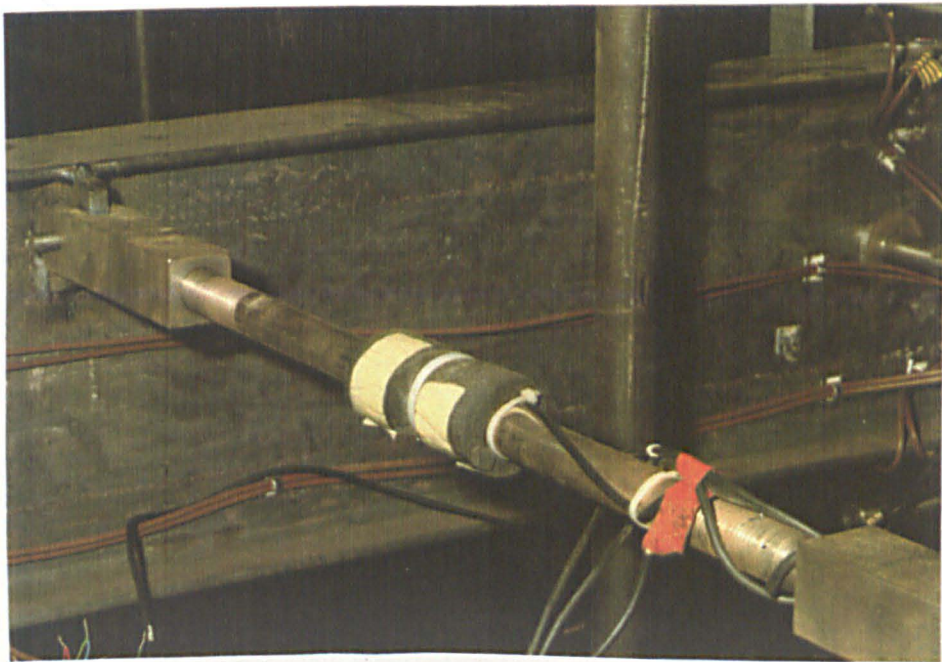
Typical 'tie bar' used to prevent column sway.
